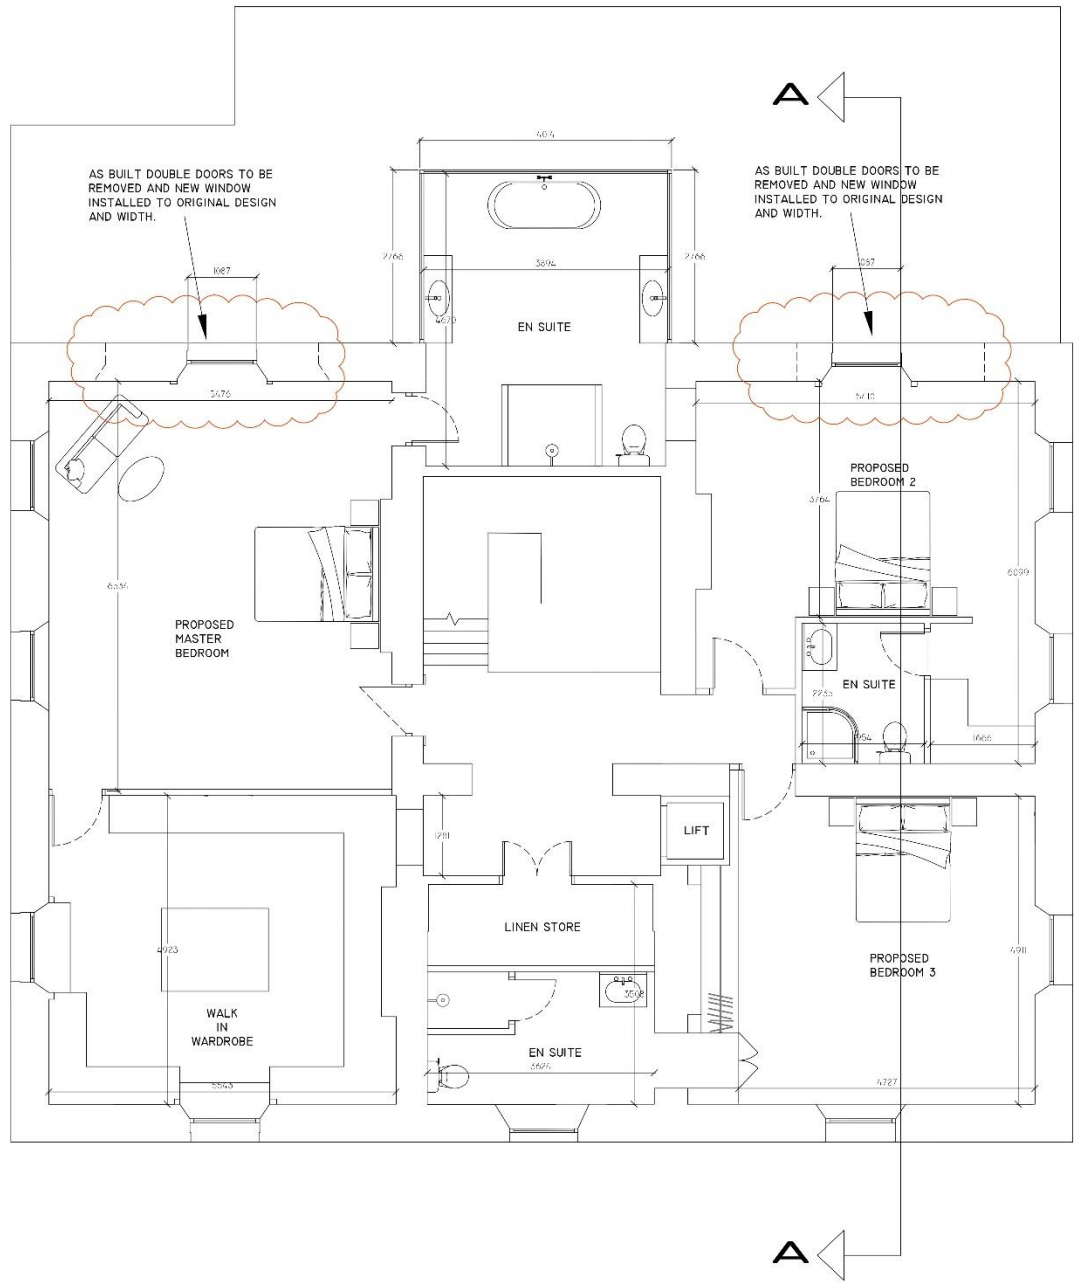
Proposed Ground Floor Plan per Further Development (Application No. 2)
